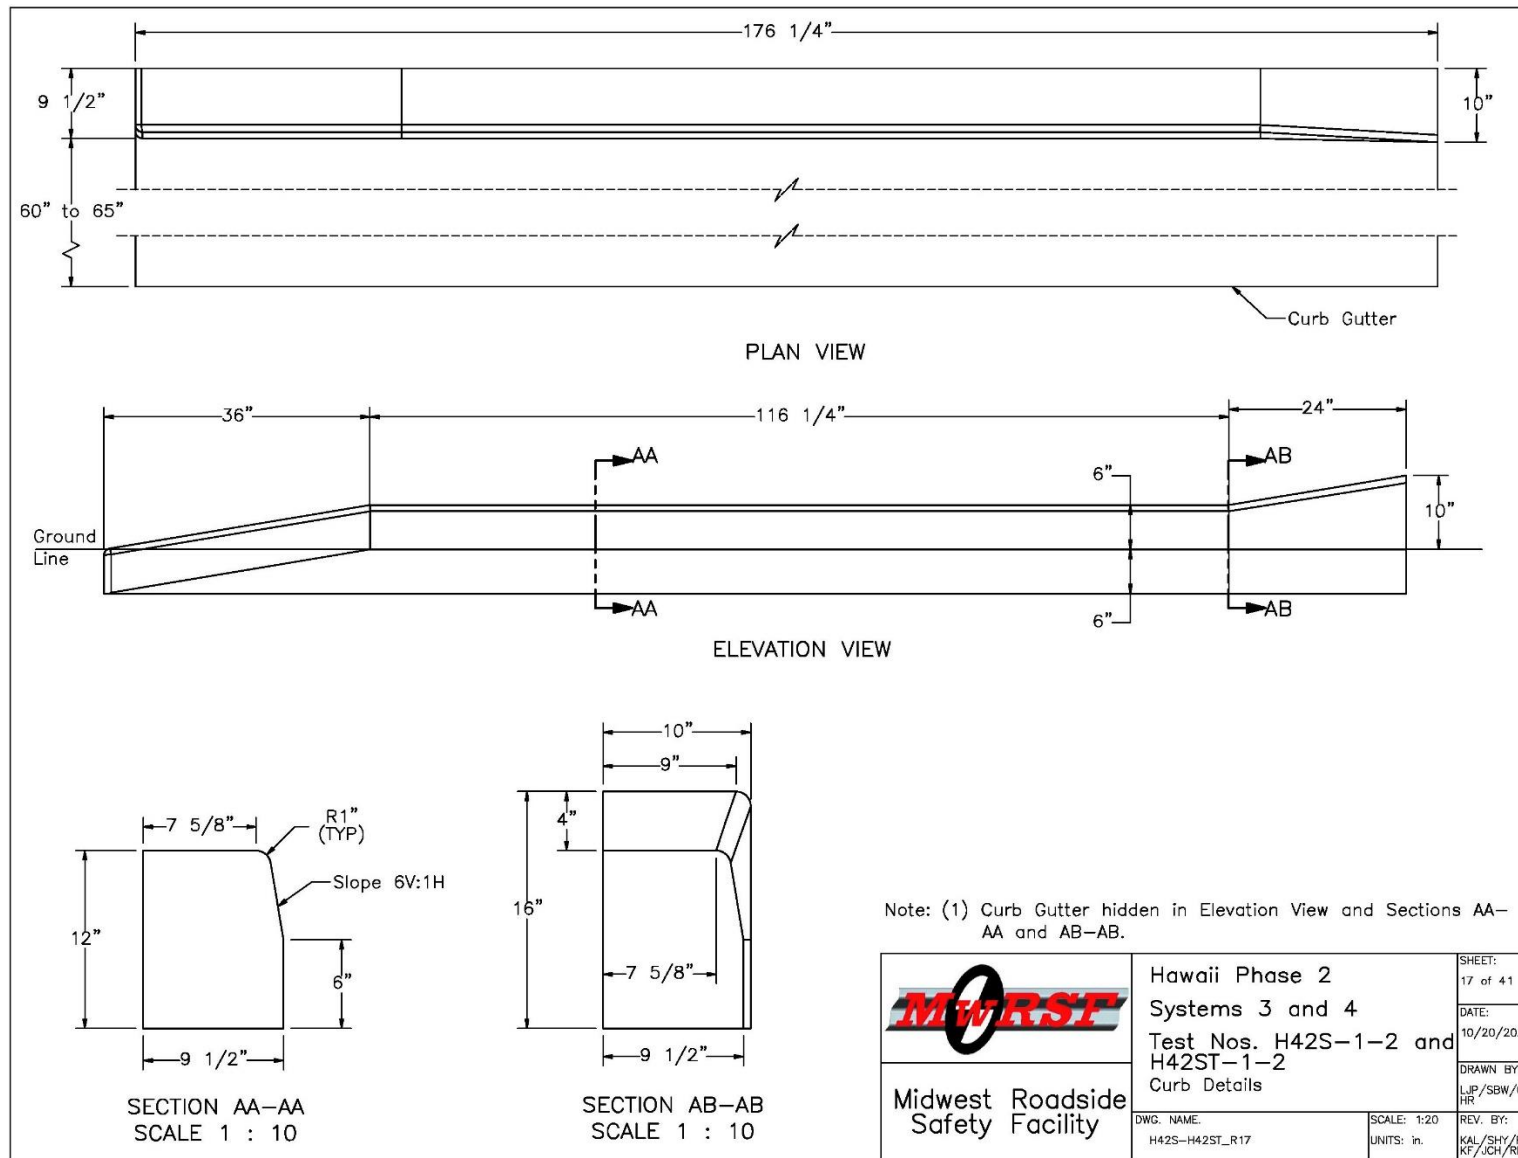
Curb Details, Test Nos. H42S-1 and H42S-2
